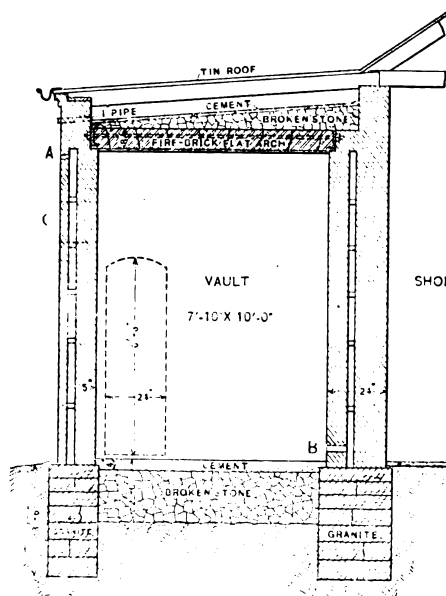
Vertical Transverse Section.—Scale, 3-16 Inch to the Foot.
